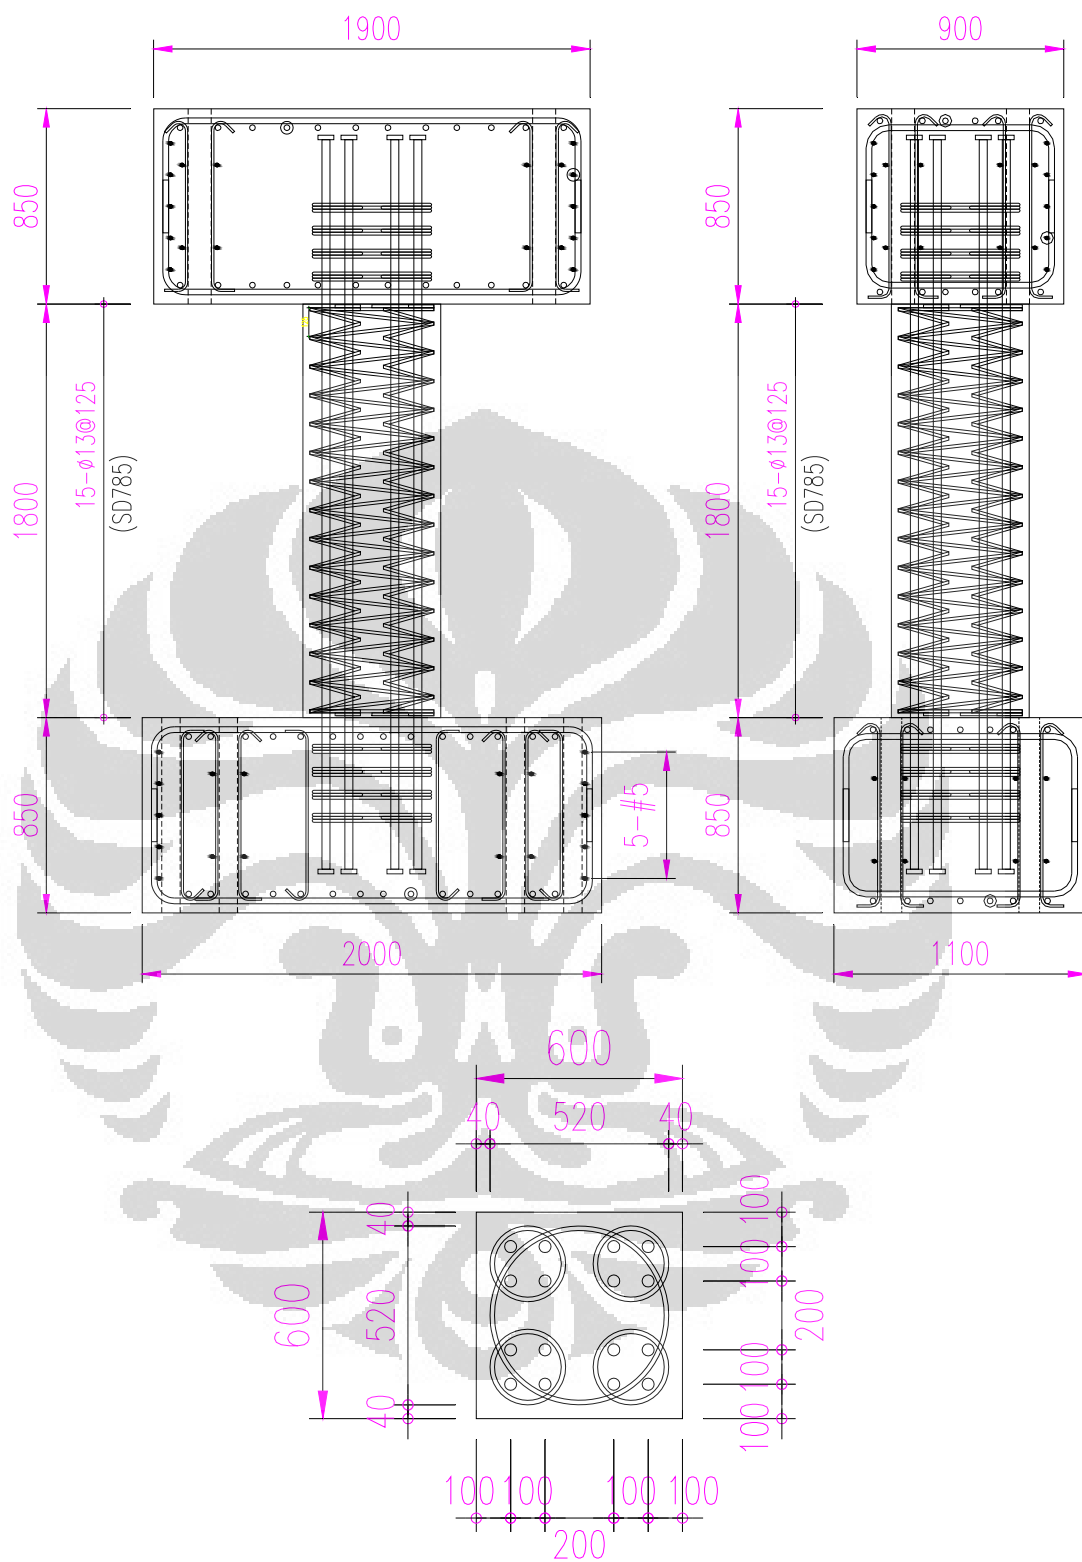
HSC Columns Design in mm with 125 mm spiral transverse reinforcement spacing
